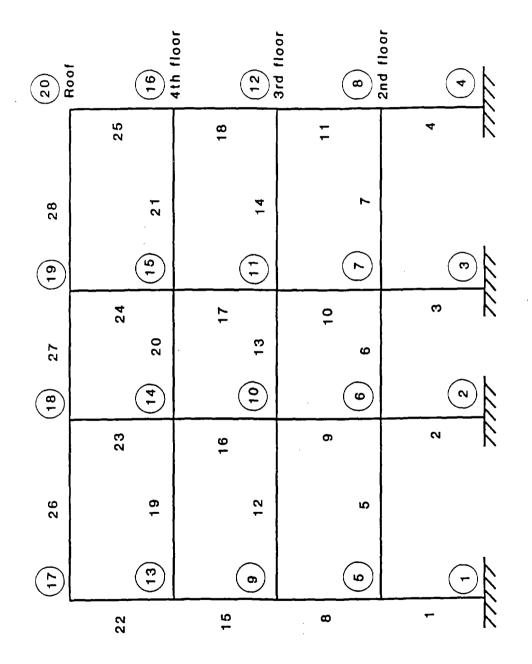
Elevation of an Interior Frame (N-S Direction)
